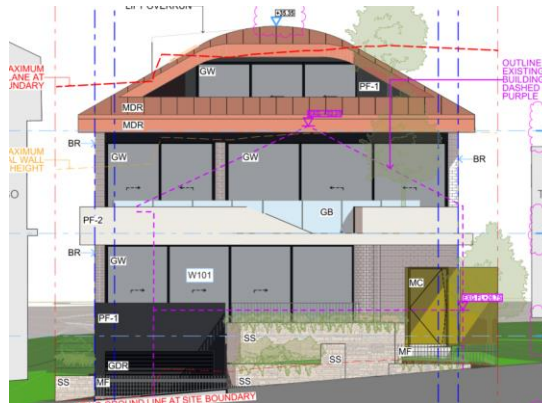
Proposed north-east elevation - 61 The Corso, Maroubra (Source: PopovBass)
